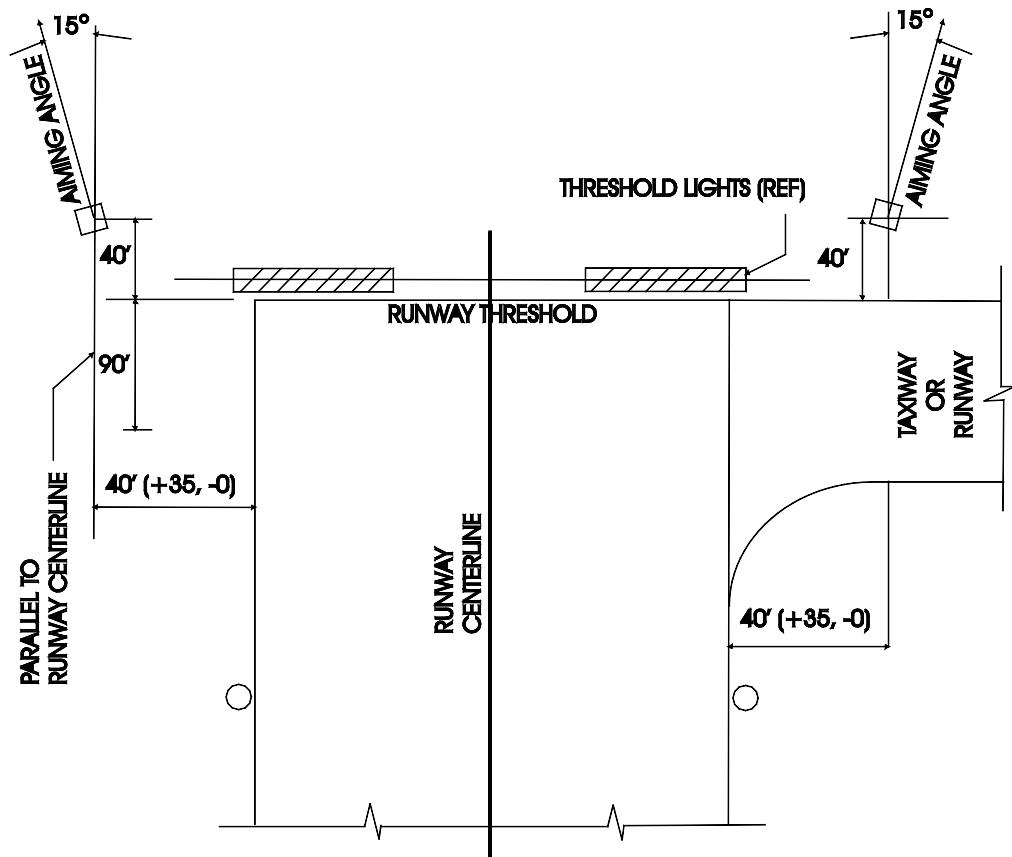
Typical Layout for Runway End Identifier Lights (REILs)
